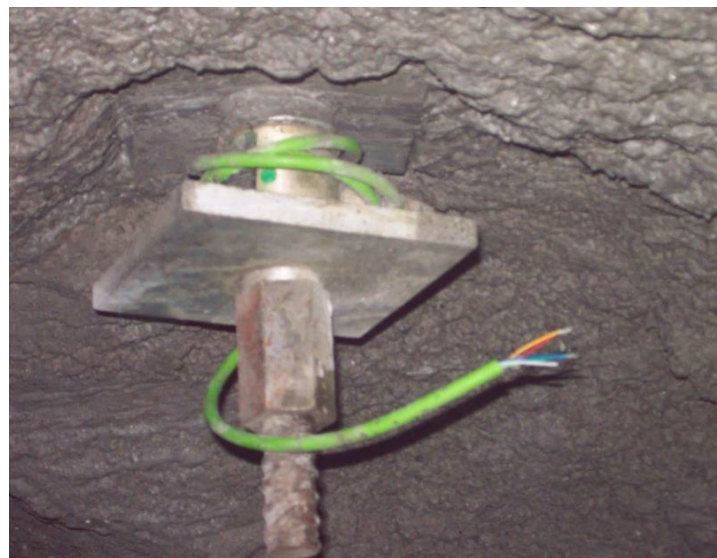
Anchor load cell installed on rock bolt at powerhouse cavern
